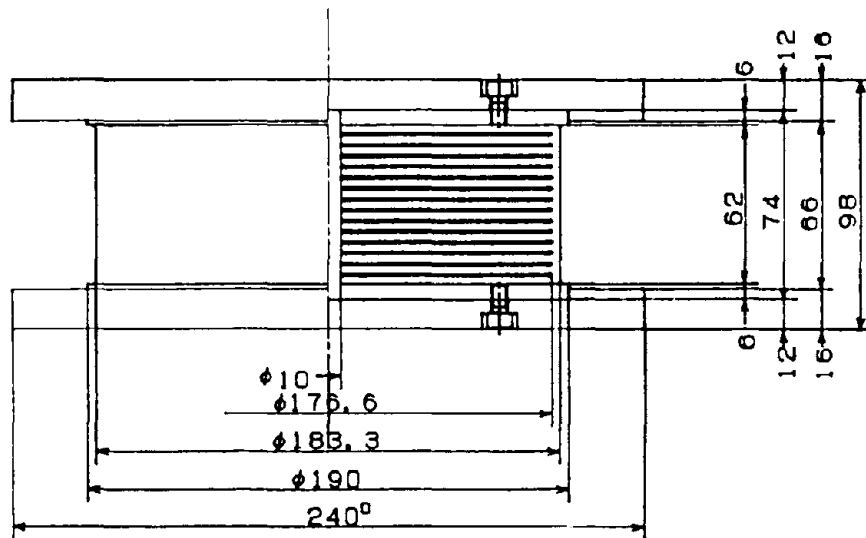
1/3 scaled model of laminated high damping rubber bearing
